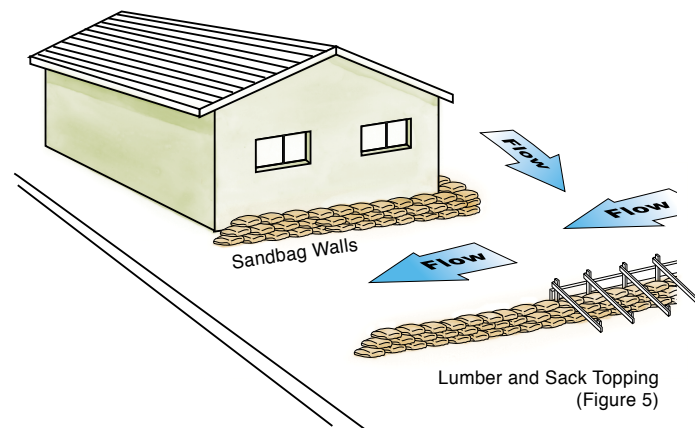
To divert mud, debris, and water, use sandbag walls or lumber and sack topping
